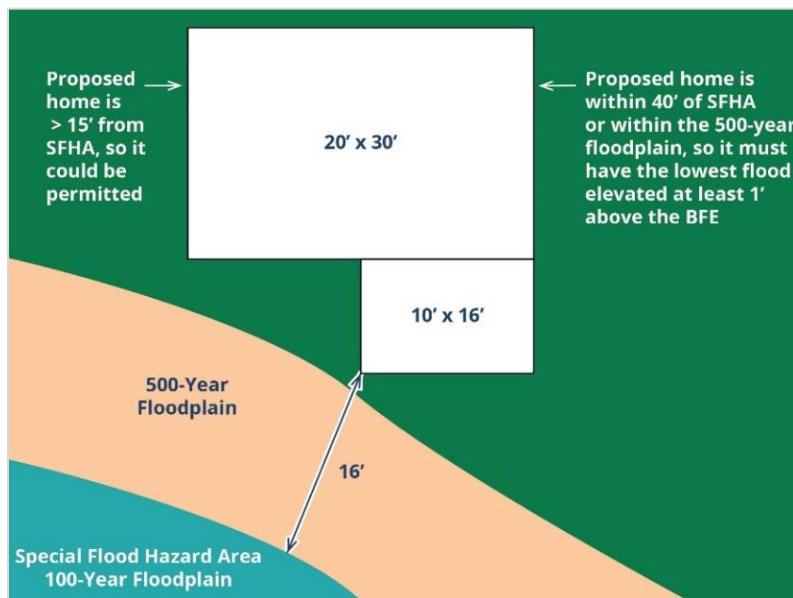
Example site plan with floodplain setback drawn to the nearest structure corner.
